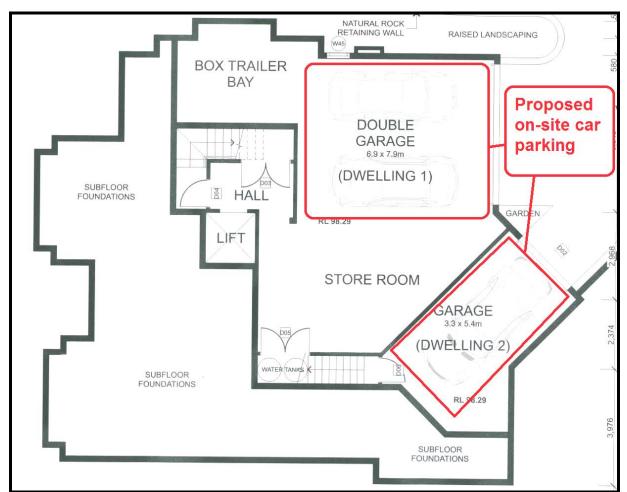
Image showing the basement level floor plan of 9 Eric Street, Eastwood. The floor plan indicates the proposed location of the three (3) on-site car parking spaces.
